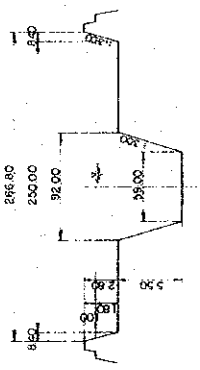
PROPOSED STANDARD CROSS SECTIONS of BENGAWAN SALA
